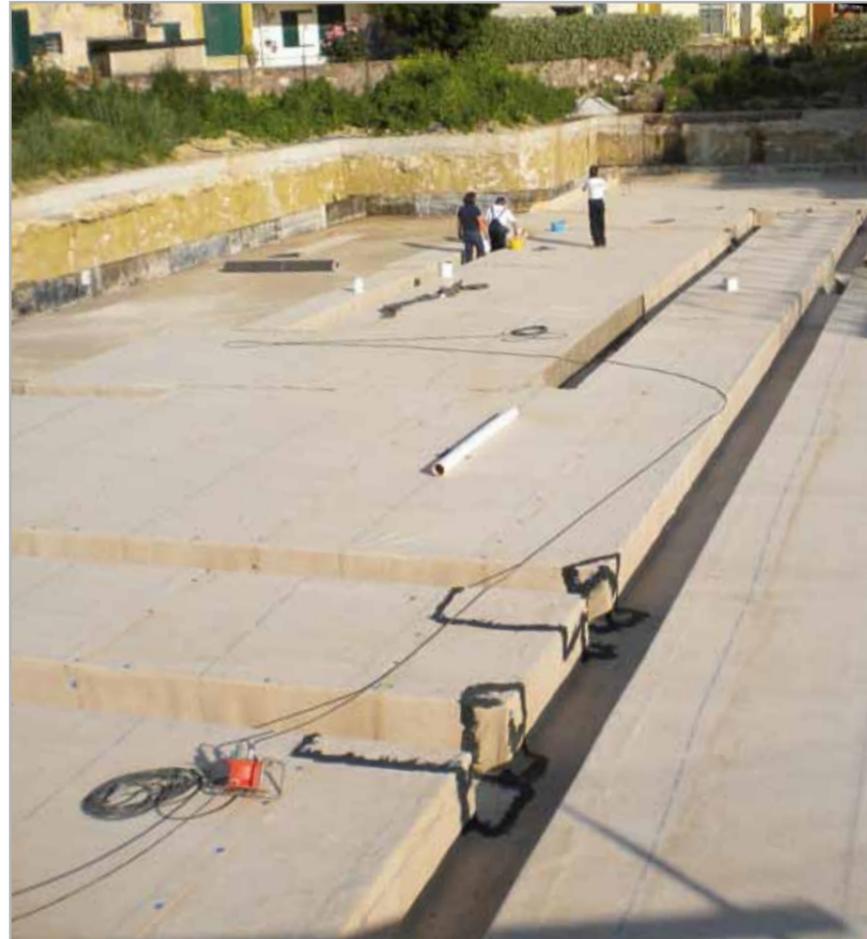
Waterproofing a ribbed foundation pad by applying MAPEPROOF
